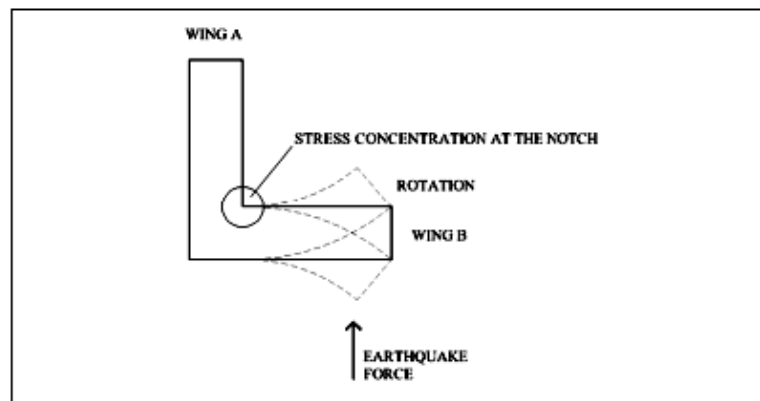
L-shaped Building Behavior under Earthquake Force
